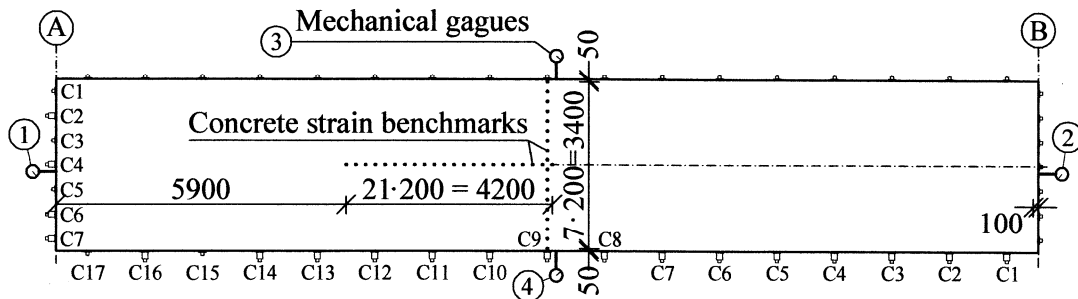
Slab contraction gauges and strain benchmarks arrangement.
